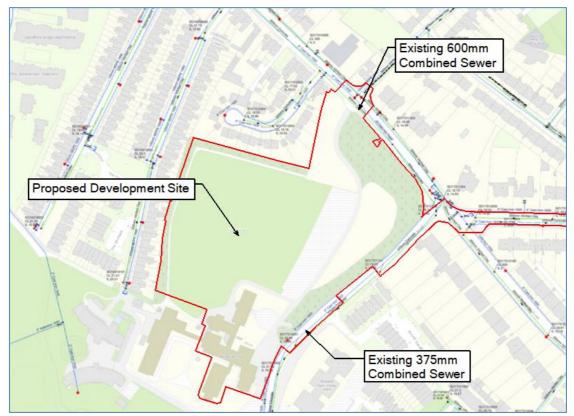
Extract from Irish Water Network Plans – Site Boundary Indicative Only
